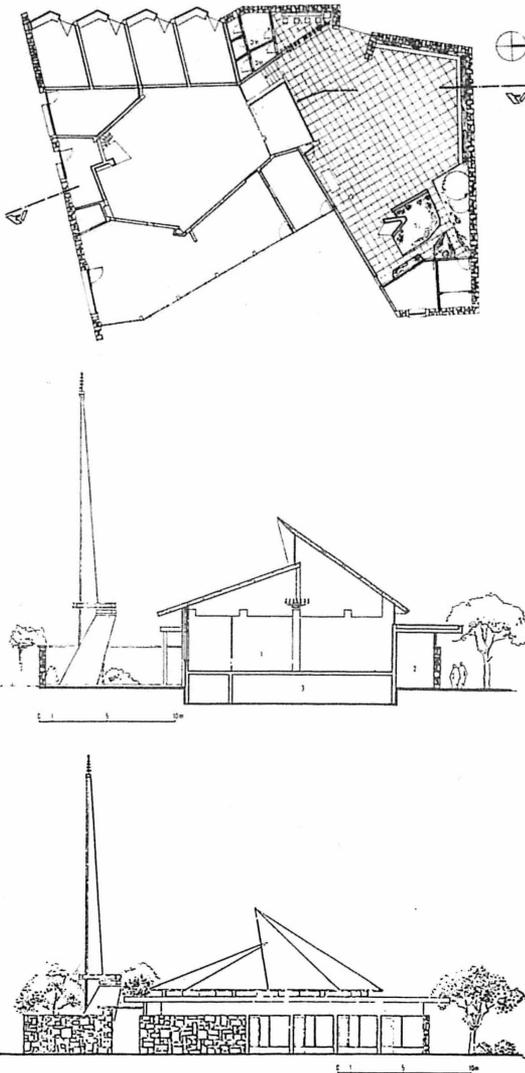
A. Plan, section, and elevation of Kinaliada Mosque, 1956. (Source: Eyüpçiller, 2012. Used with permission.)
